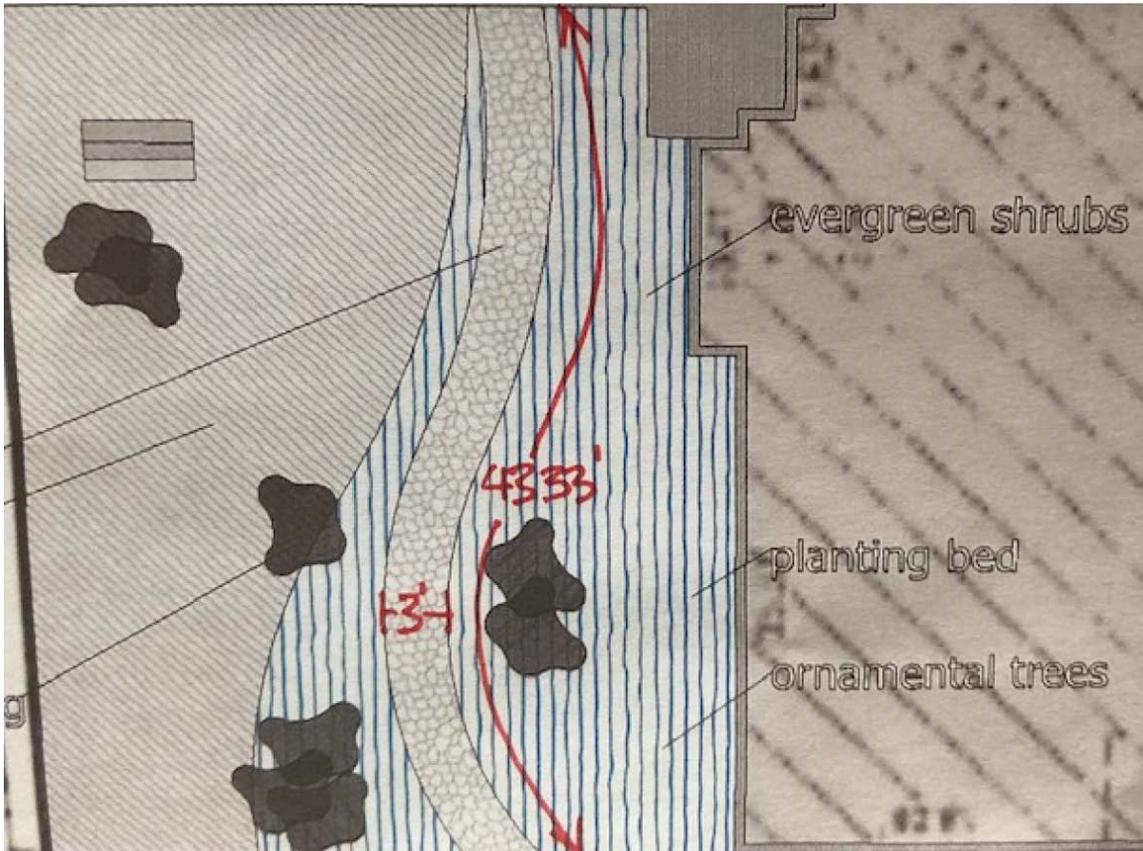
Excerpt of Proposed Site Plan – West Walk
